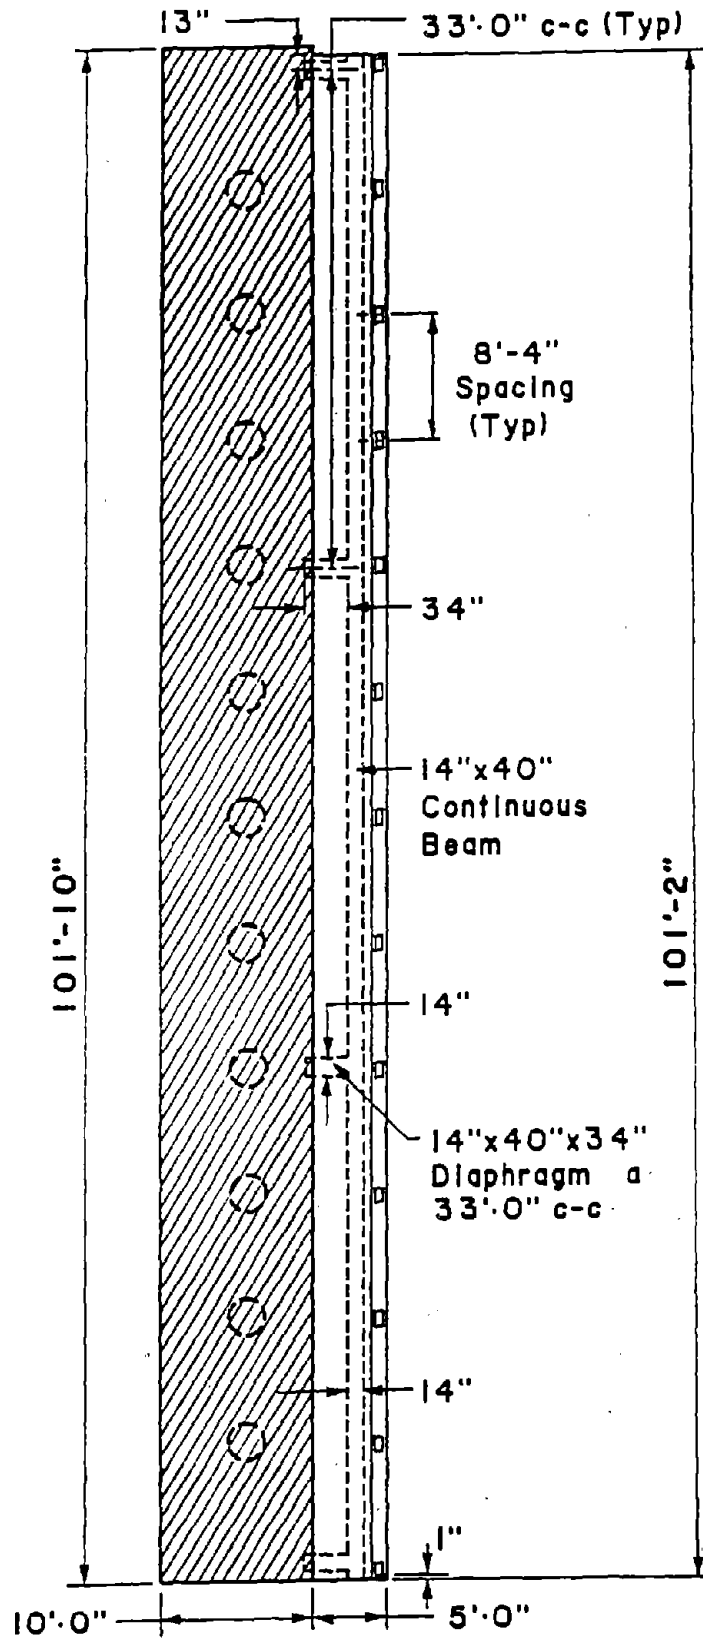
Dimensions and elevation of the modified T5 bridge rail. (8)
